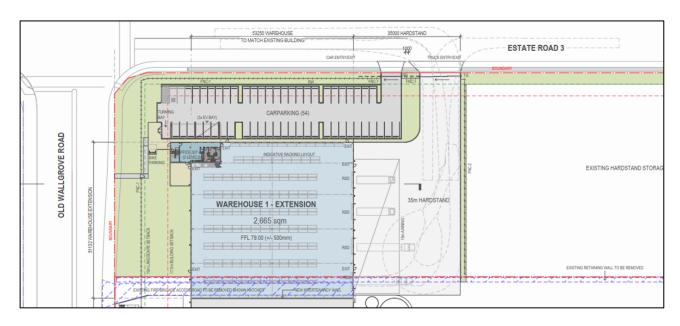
Proposed SSD Site Plan for the Precinct 1 Expansion
